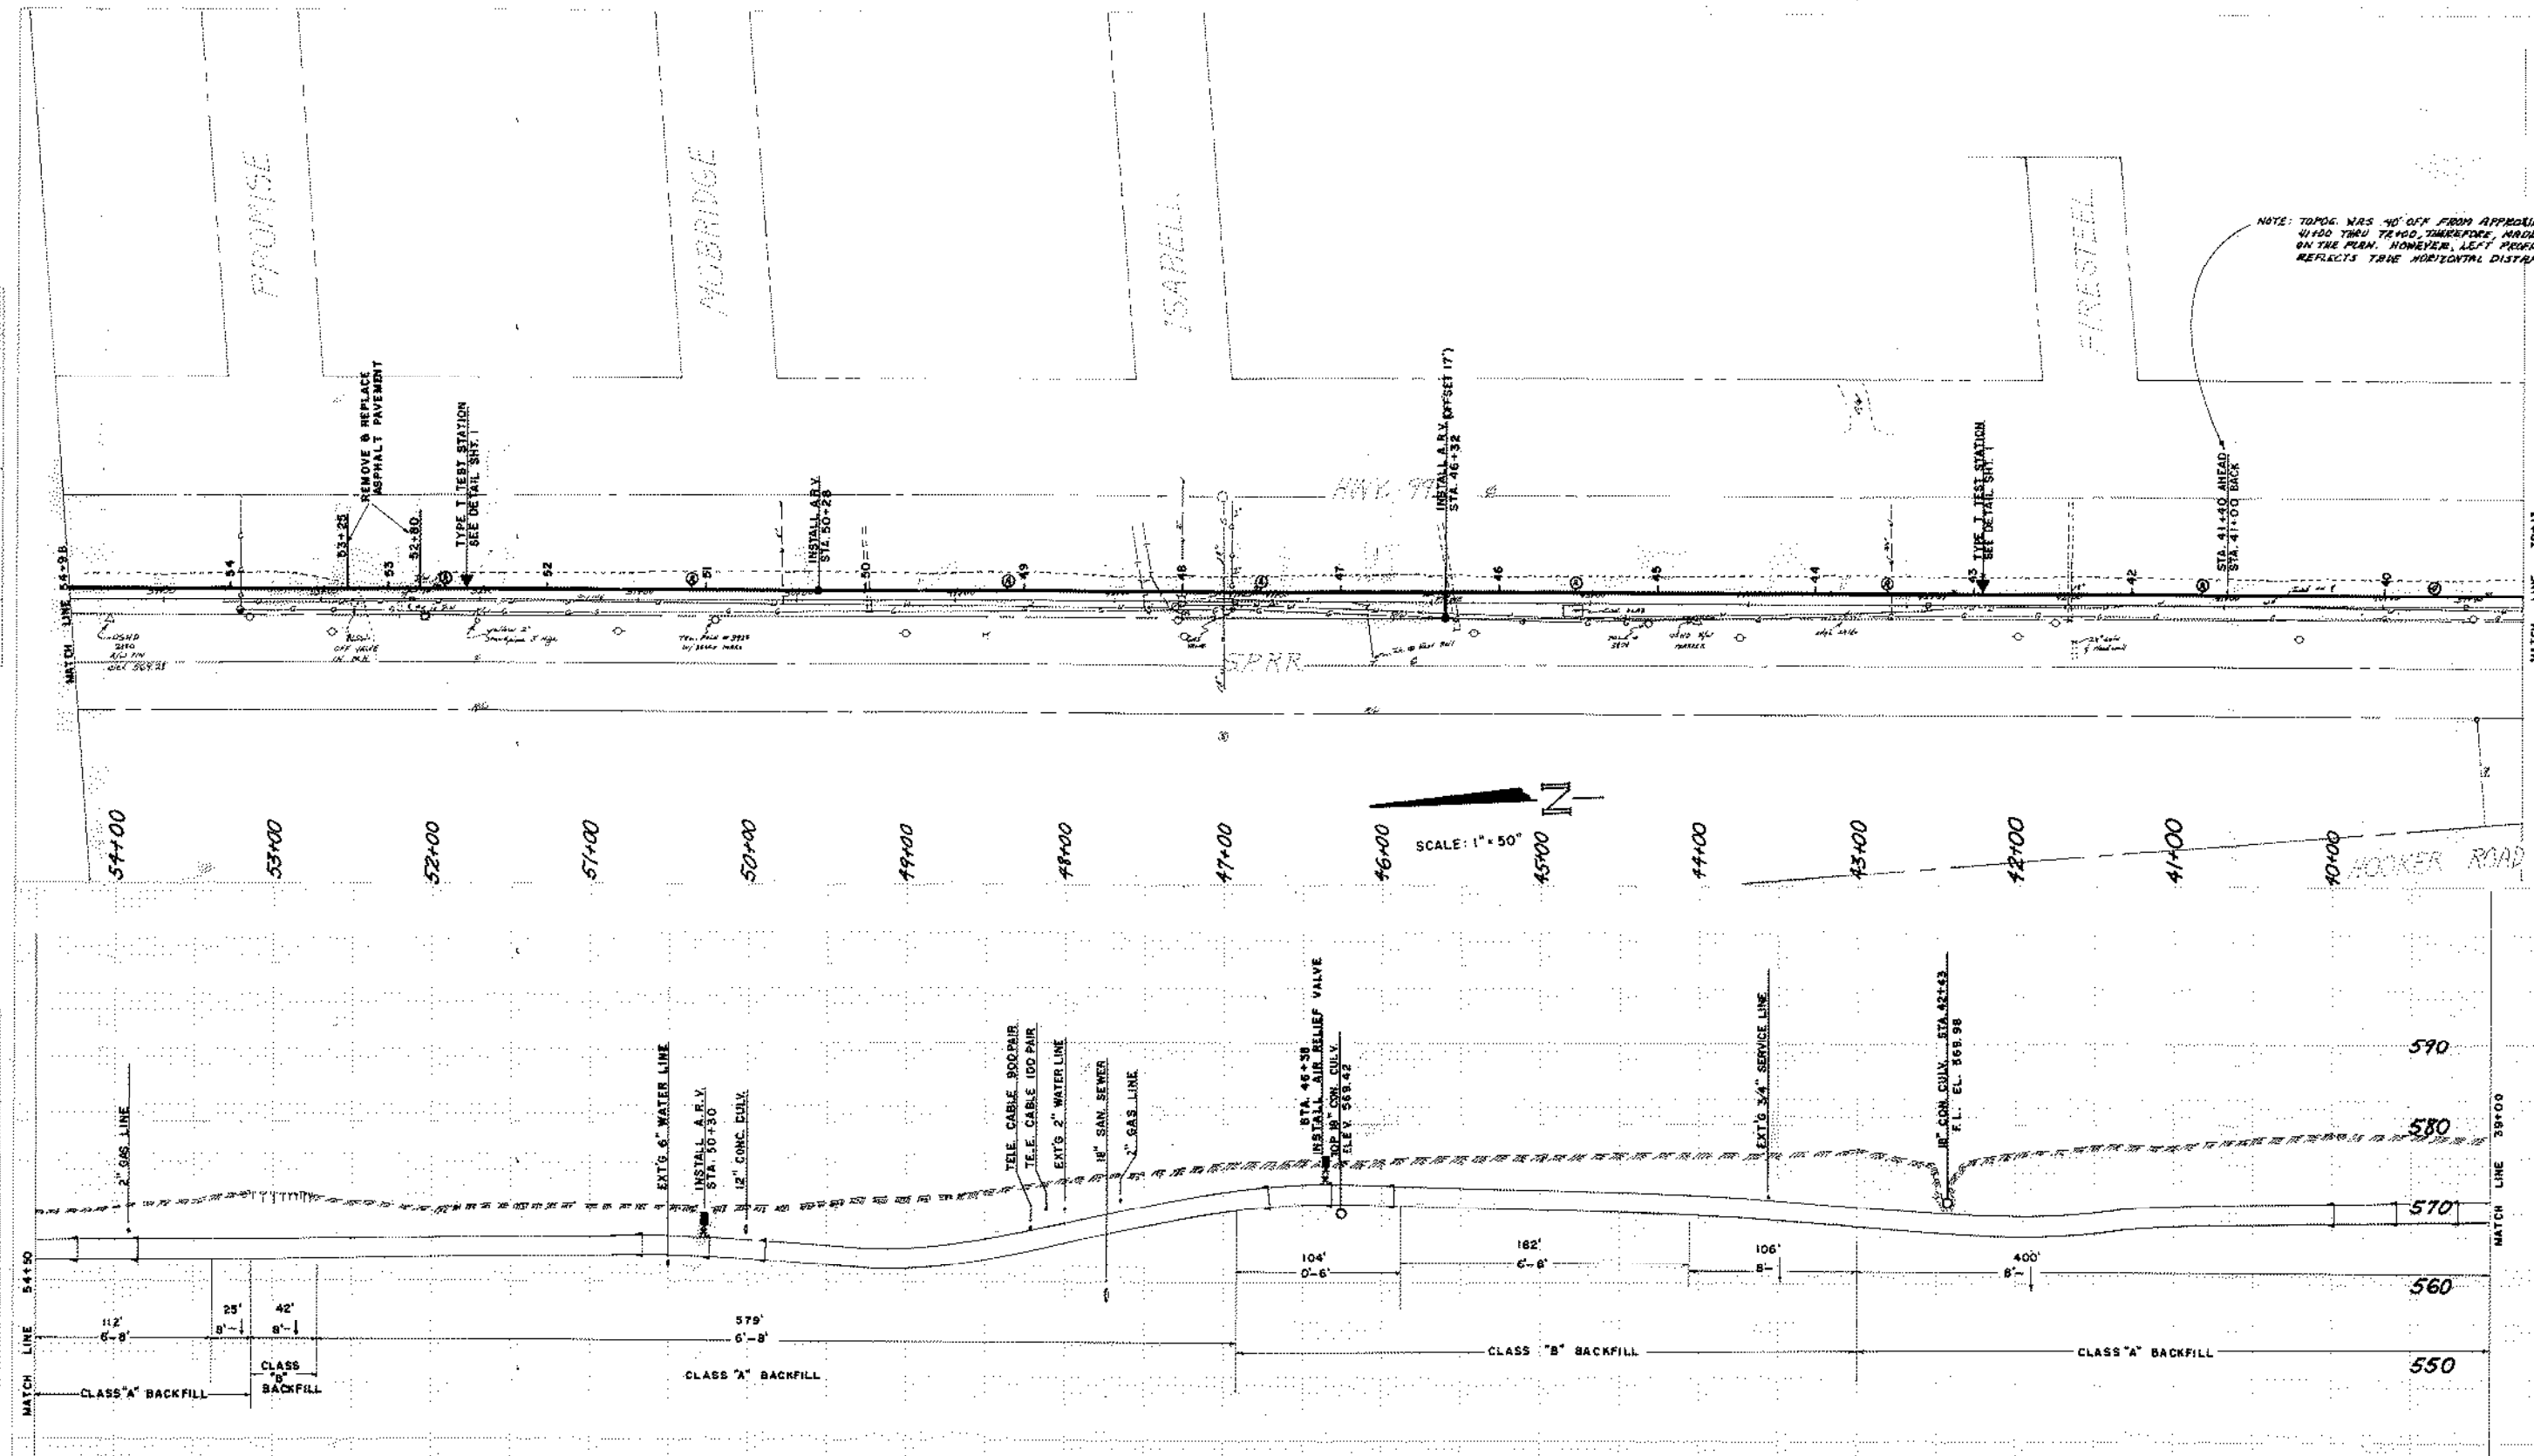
SINGLE PLAN AND CROSS SECTION, P. 007
